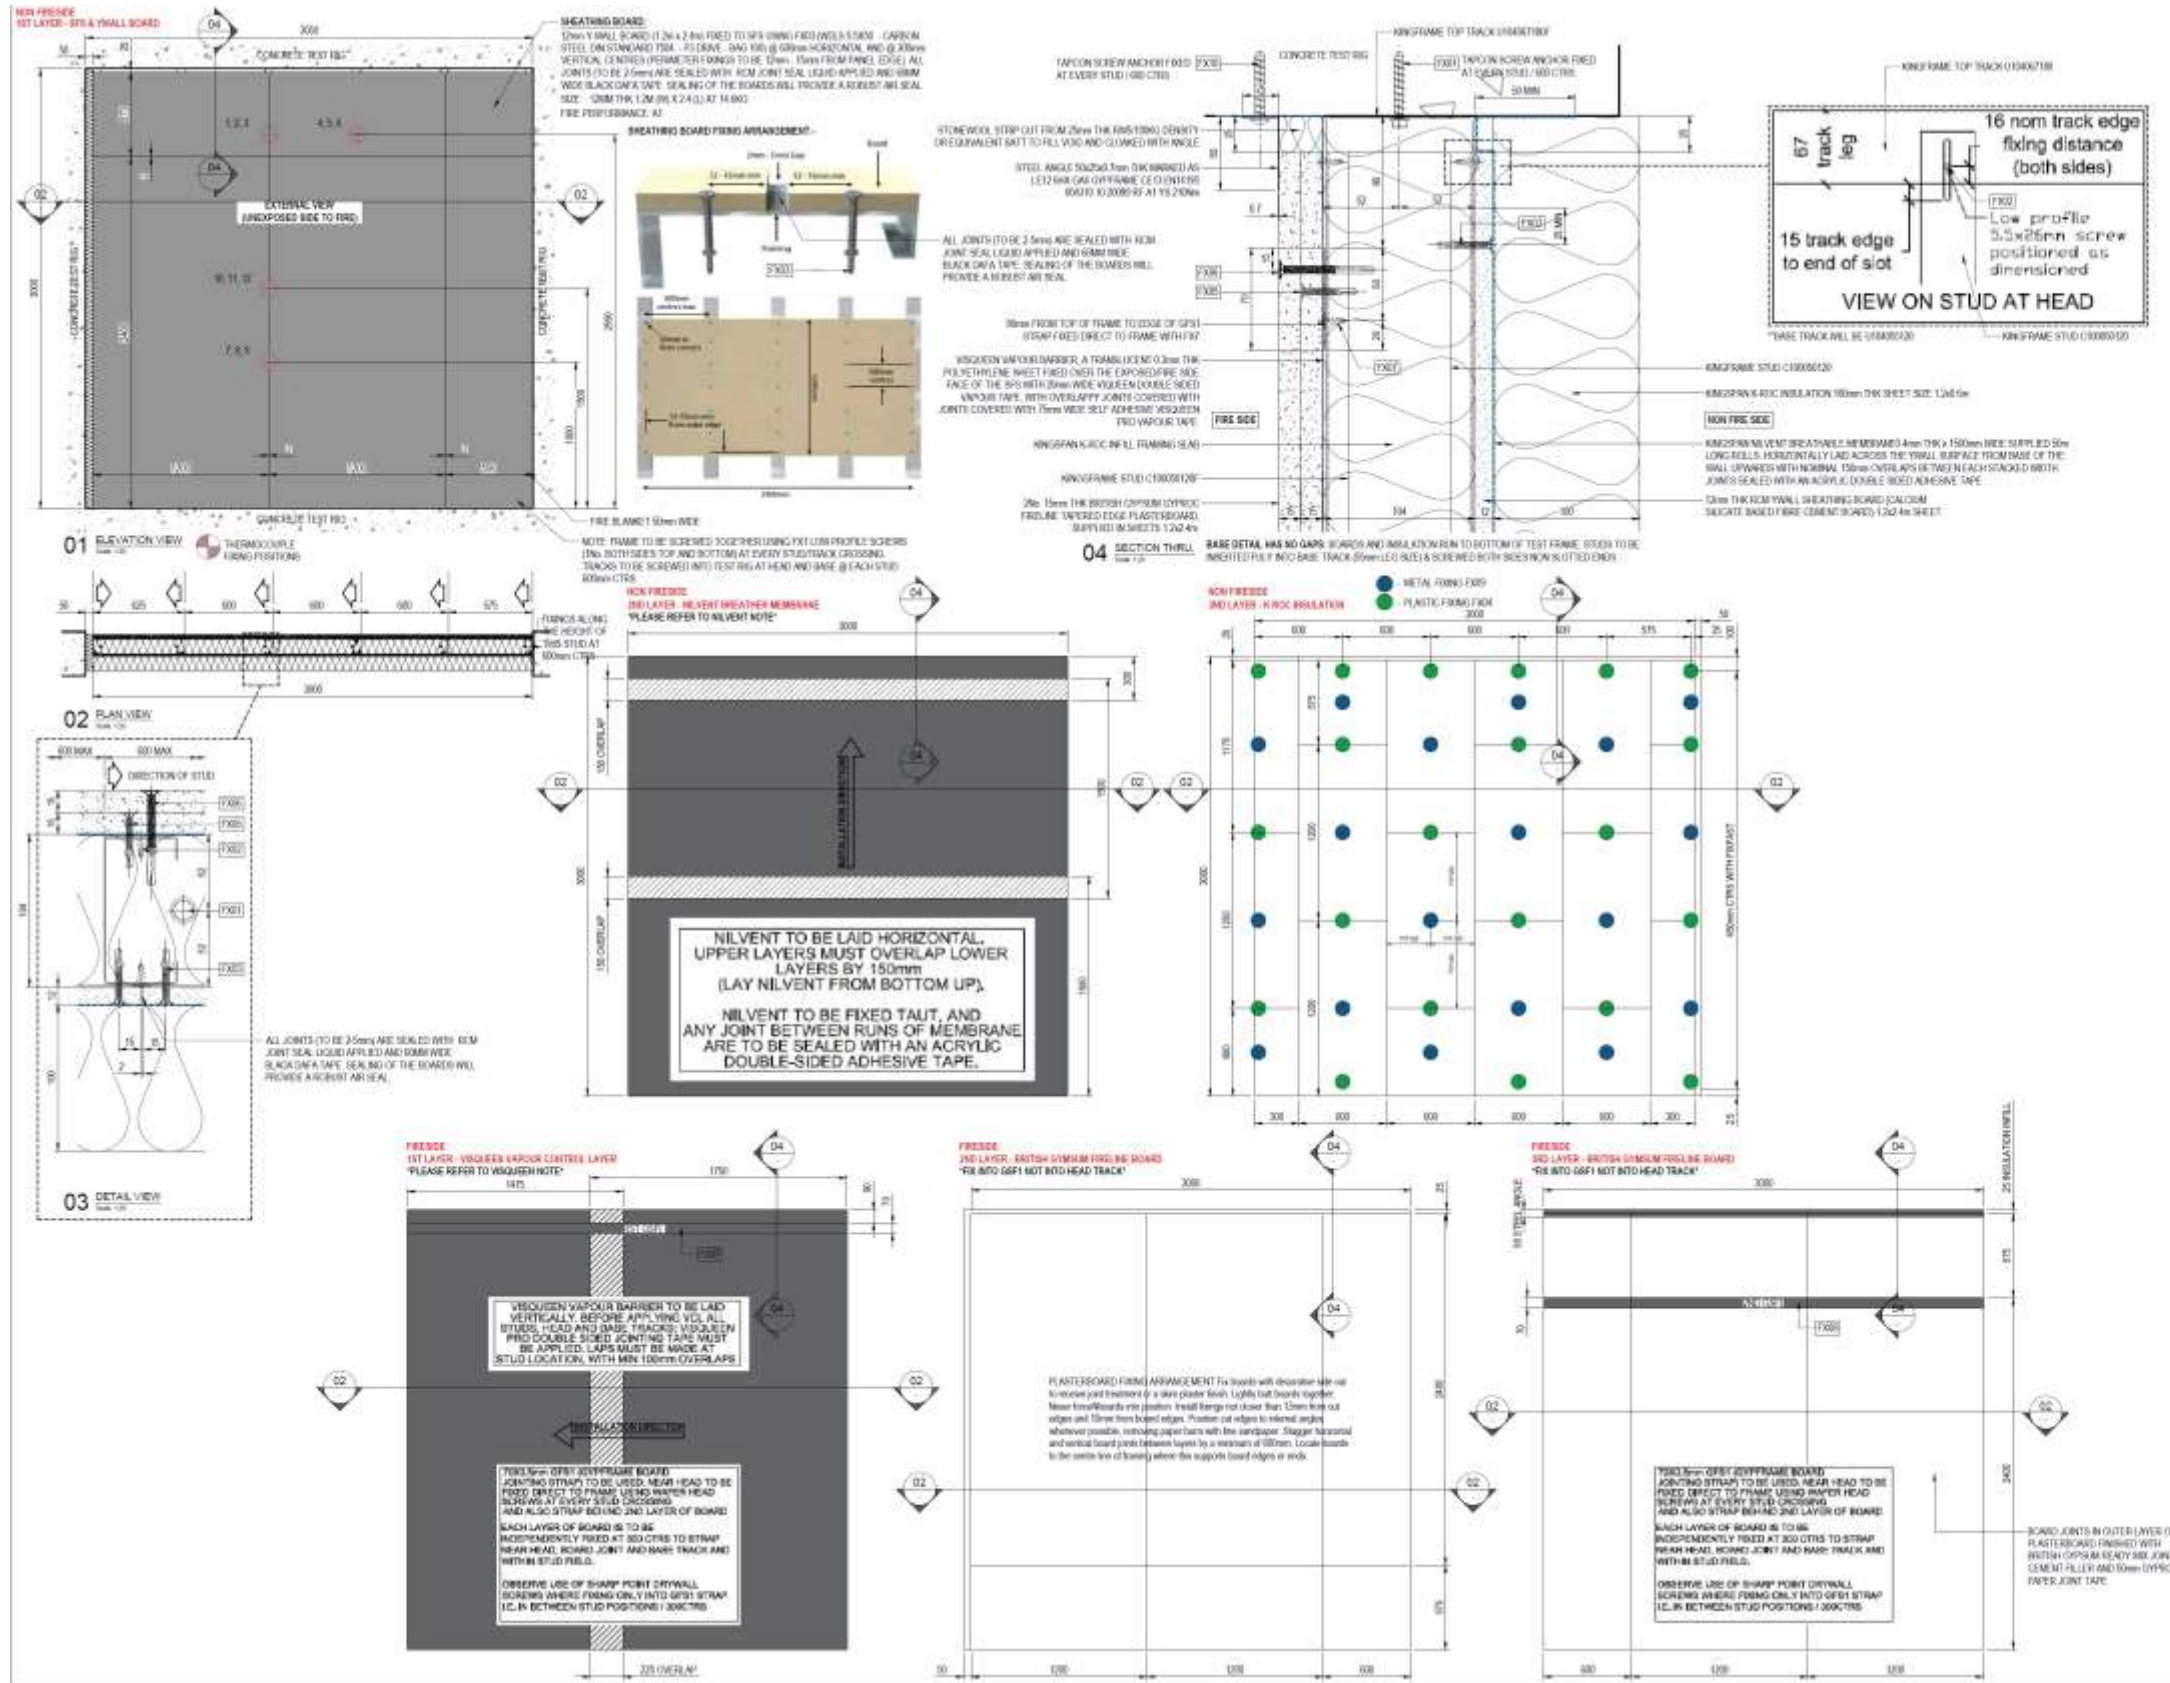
Drawings provided by the Sponsor – Test EUI-21-B-000335-A
